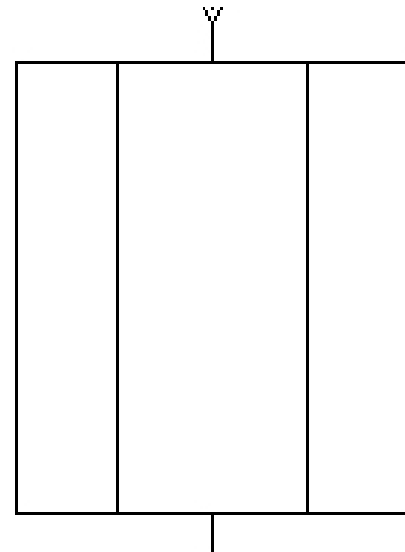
Positioning of lap joints of a partially bonded assembled "system" incorporating a supporting layer
